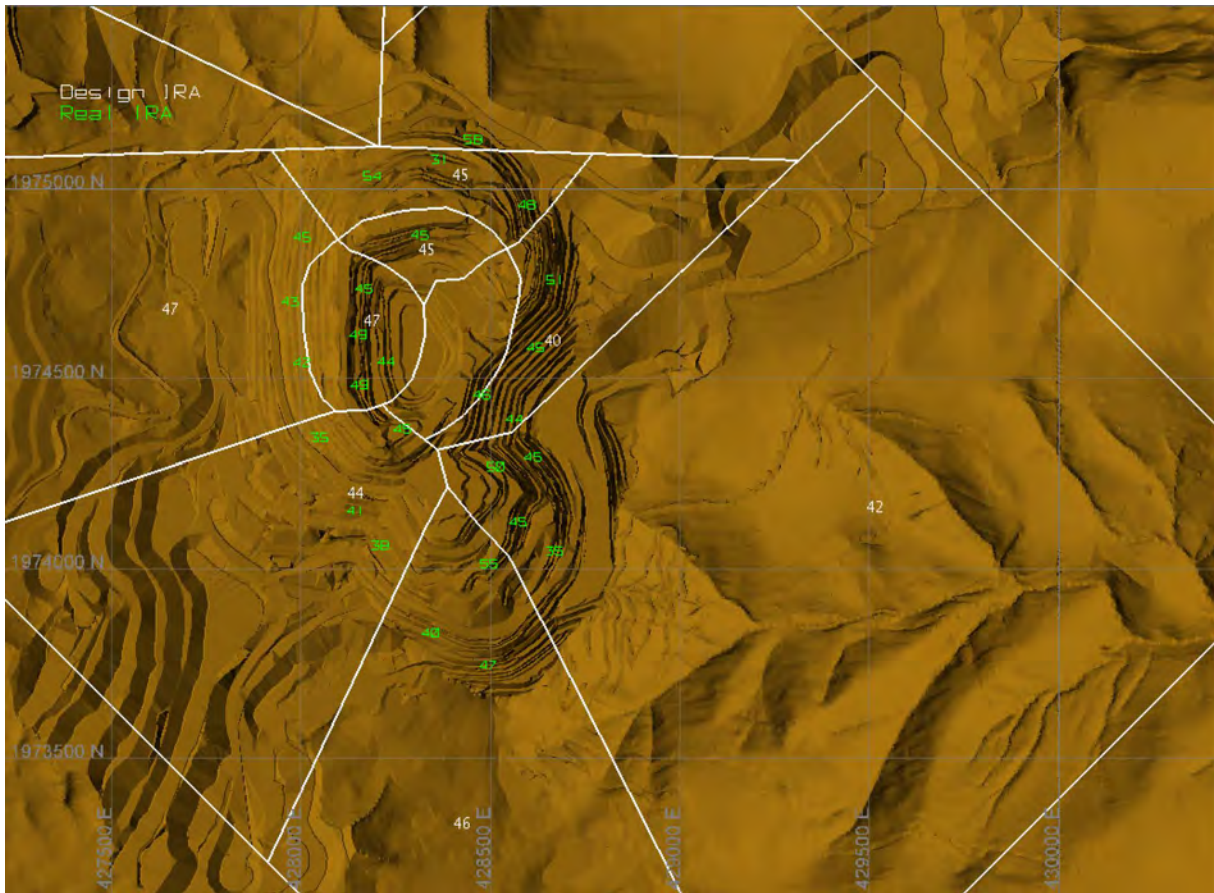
Plan View of Los Fillos Open Pit (Design and Actual Inter-Ramp Angles)
